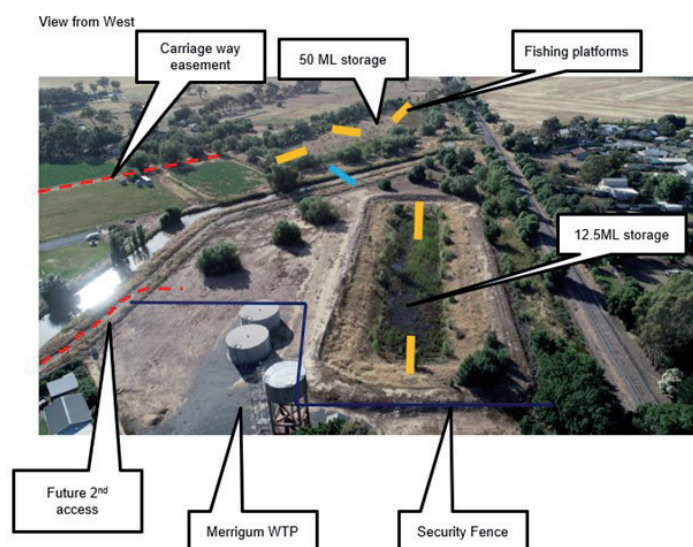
Concept plan overlaid on the existing Merrigum WTP site.
